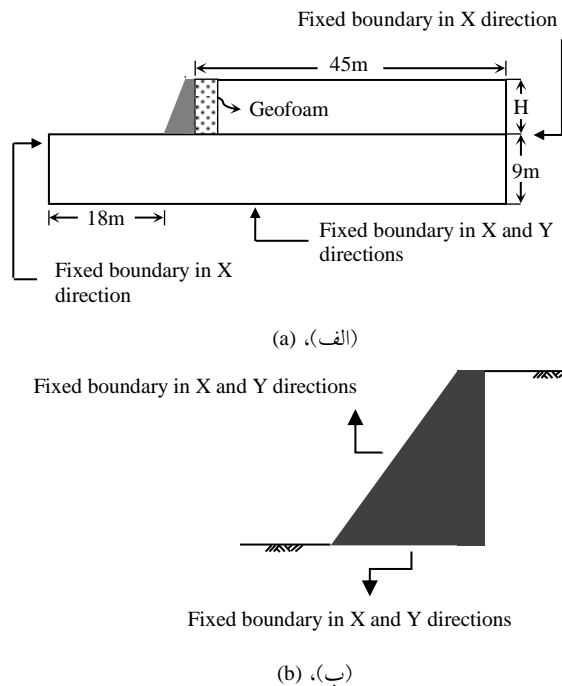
Gravity retaining walls boundary conditions (a) yielding retaining wall, (b) Non-yielding retaining wall.
